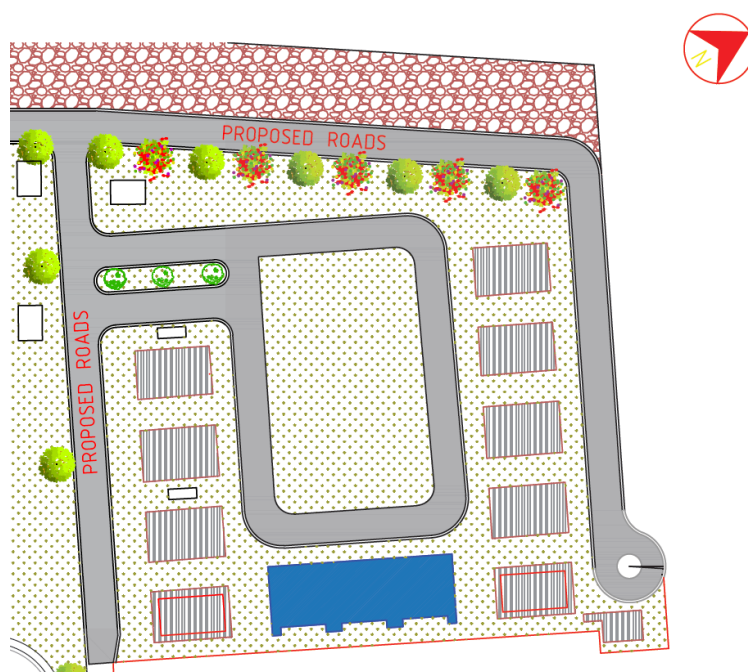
Preliminary Bungalows area site layout, communal building shown in blue, nine buildings shown but ten buildings are confirmed under construction.
